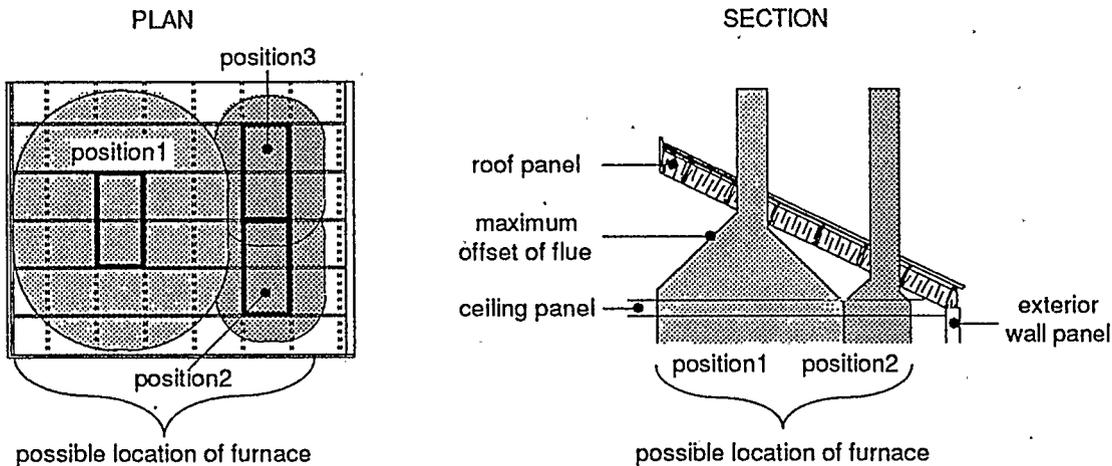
Plan and Section of roof panel with aperture showing possible locations of furnace
